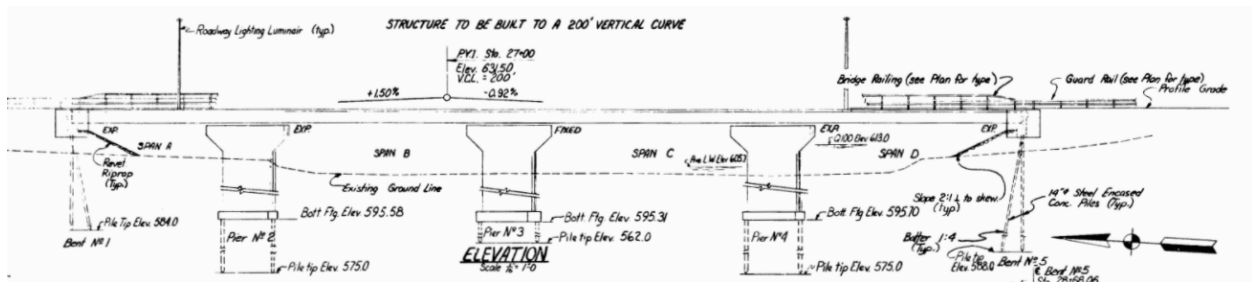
Elevation View of Structure 052-24-06649 (NBI 19430) (INDOT, 1982)
